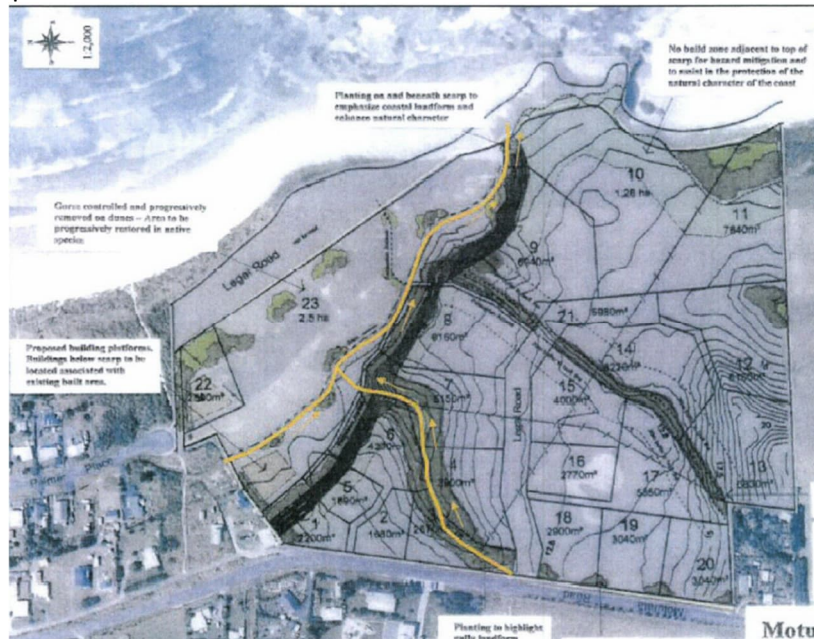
Scheme Plan from the adjacent subdivision RM1636 01
